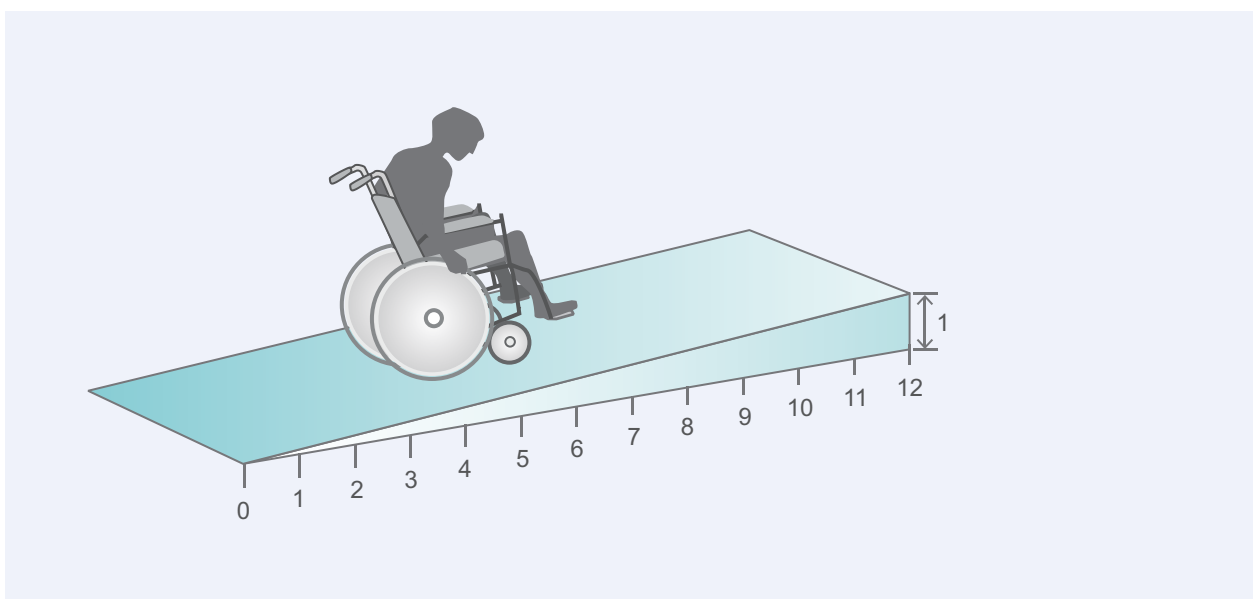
The slope of a ramp should not be steeper than 1 in 12.
